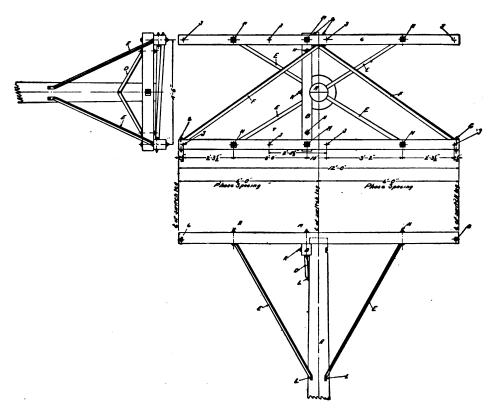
Suggested Framing for a Single-Wooden-Pole Mounting for the 22,000 to 44,000-Volt Type T Horn-Gap Switches
